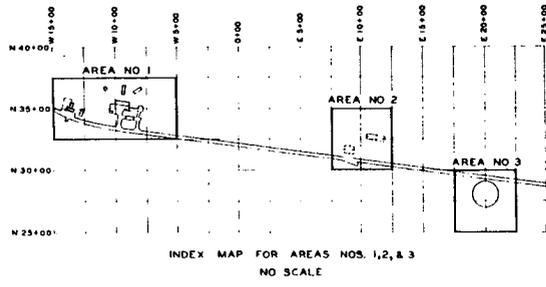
Structure Location Plan for TA-6 - Two-Mile Site (1961 Drawing from the LANL Technical Area Structure Location Plans)
